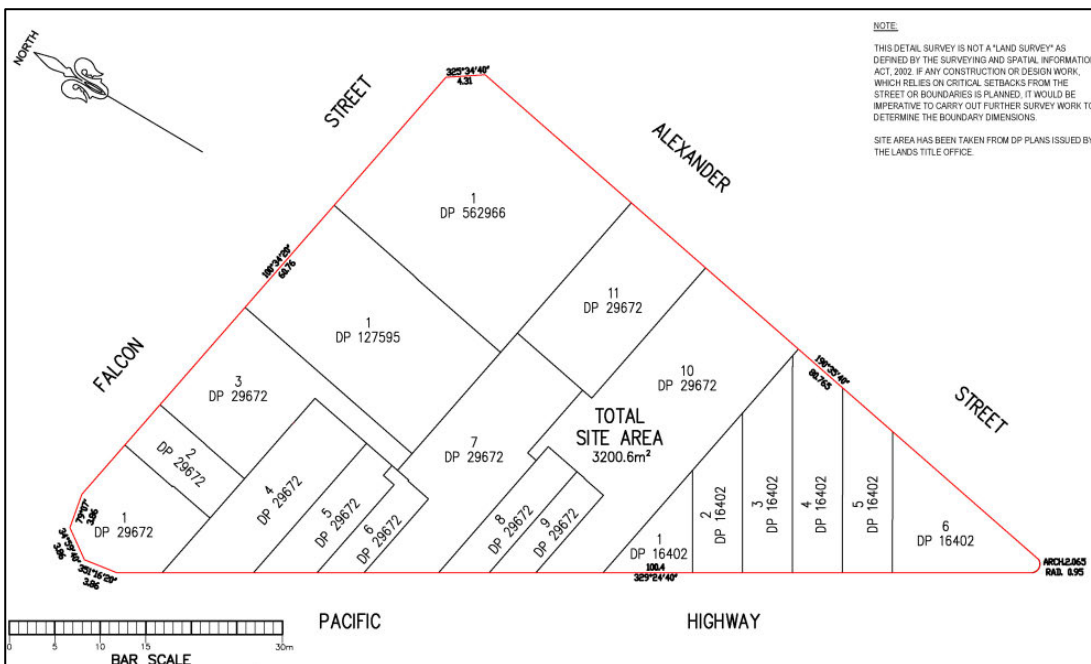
Site survey (Source: *planning proposal, Gyde March 2023*)
